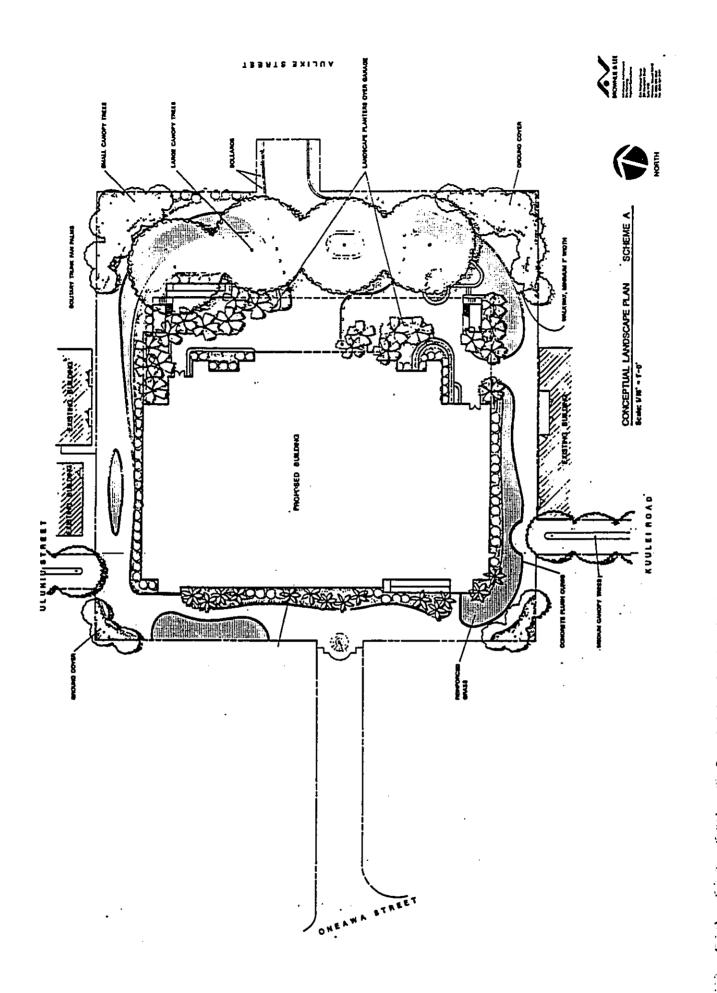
shows the proposed site plan. Vehicular access for the site is proposed via an existing driveway on Aulike Street. Existing pedestrian access between the site and Kuulei Road, Oneawa Street, and Uluniu Street would be maintained. The existing one way vehicular entrance to the public parking off Oneawa Street would eliminated. Existing access to adjacent properties would be maintained.
